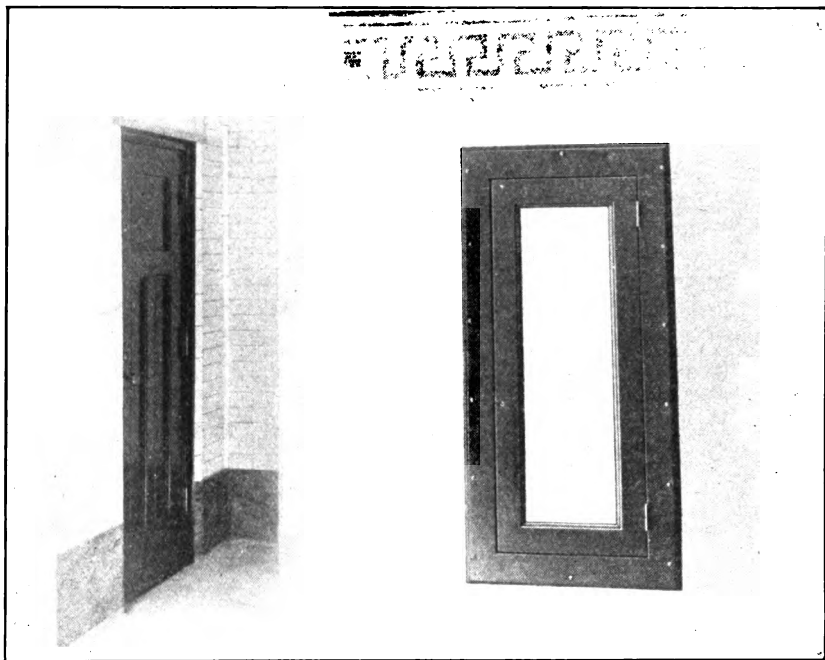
PANEL BOARD DOOR AND FRAME.
